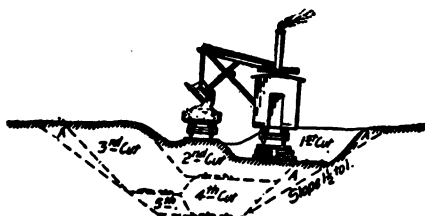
Cross Section of Cut; Shovel Super-Cutting.
